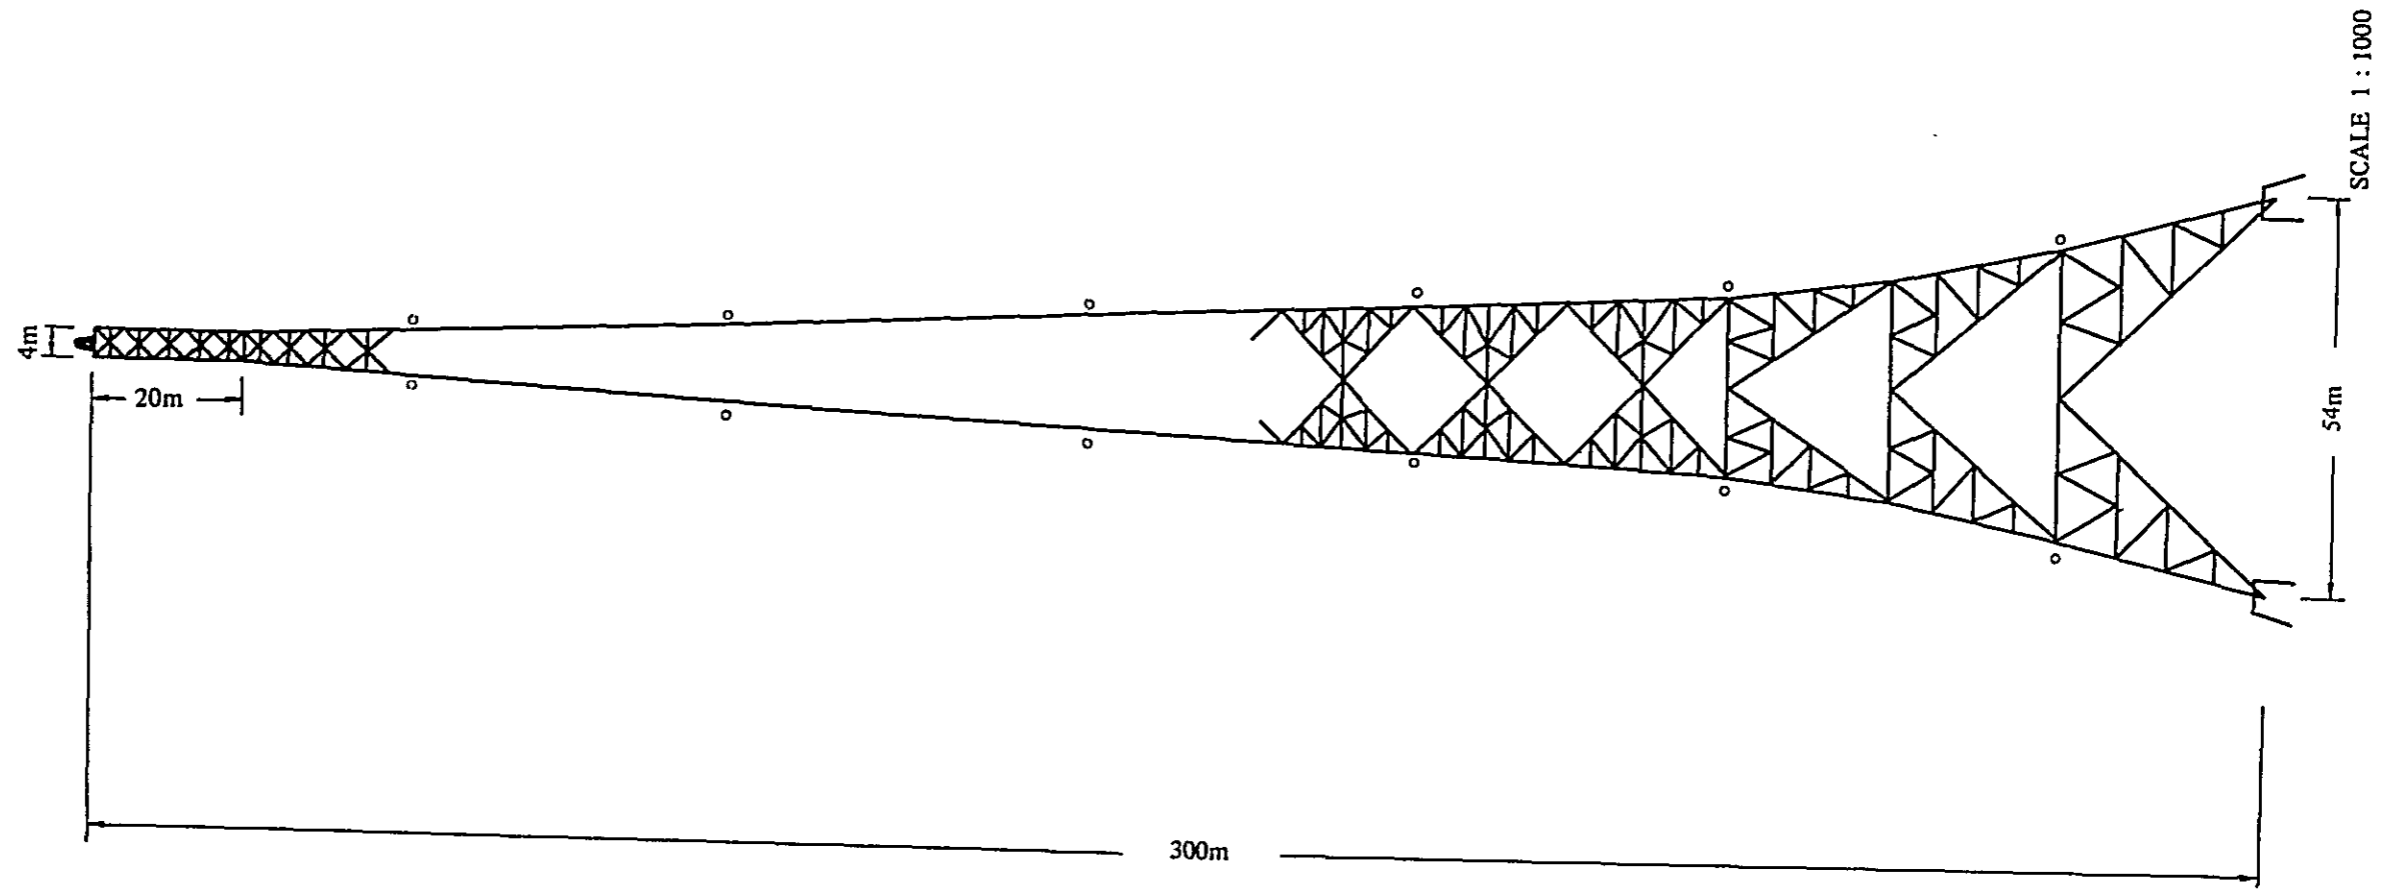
Plan of Self-Supported Tower (300m Height)
